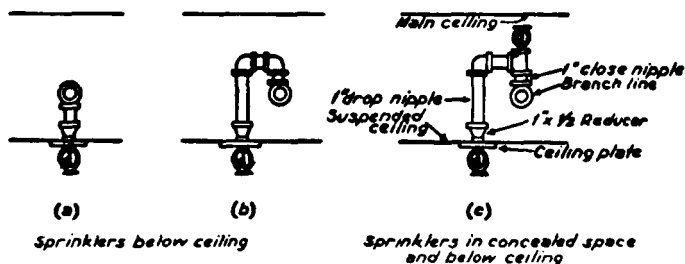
Pendent Sprinklers at Suspended Ceiling.
